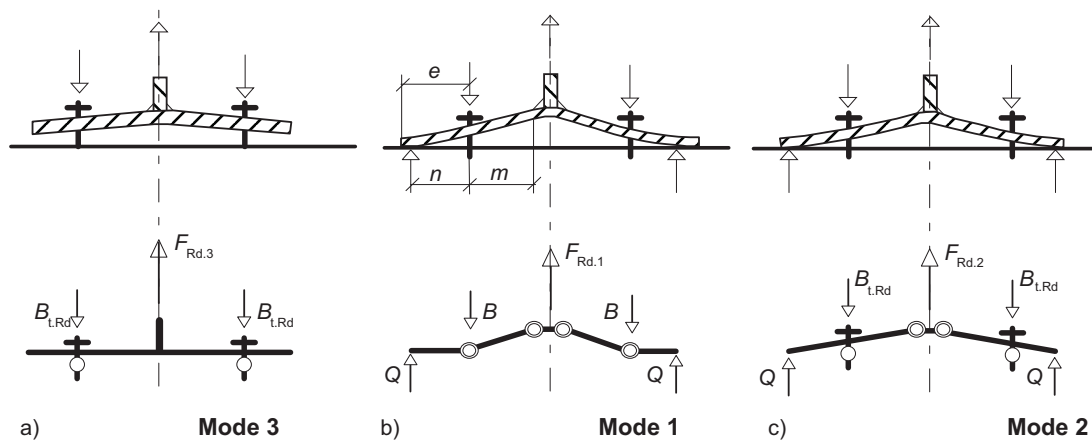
Failure modes of the T-stub in contact with the concrete foundation
